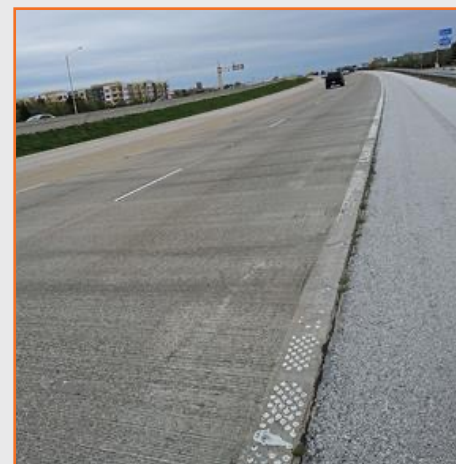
PGBT pavement marking deterioration SBML south of N. Shiloh Rd.
